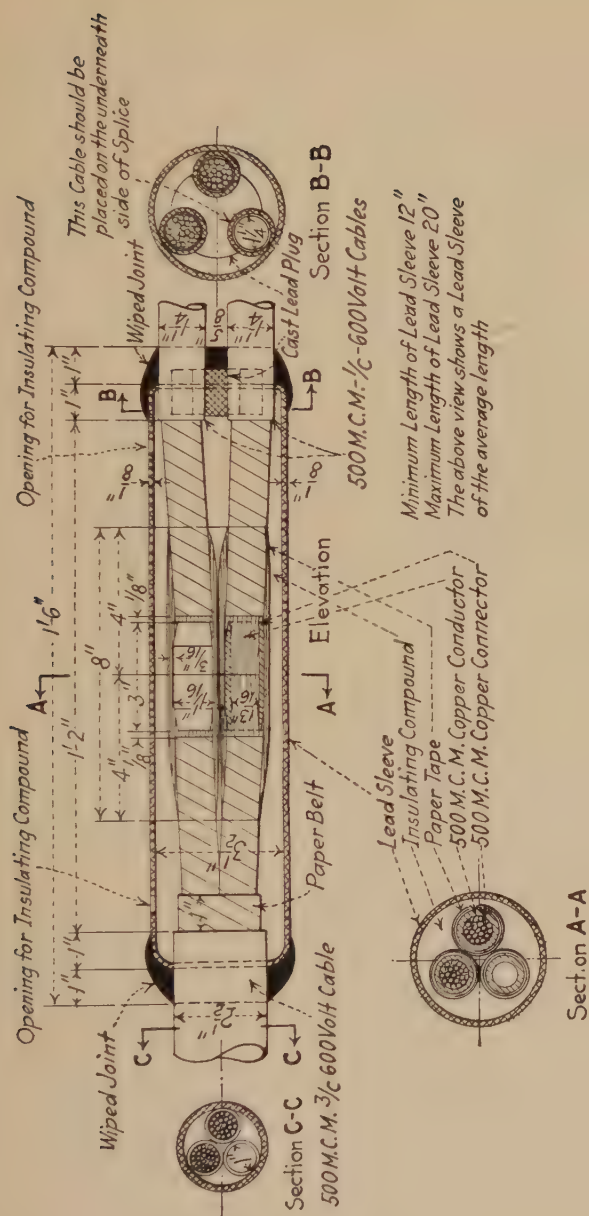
Drawing of 500,000 cir. mil three way cable splice.
